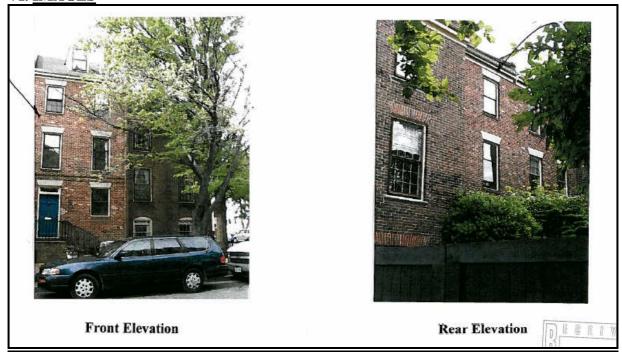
Photo of front and rear elevation of 216 Wilkes Street.
